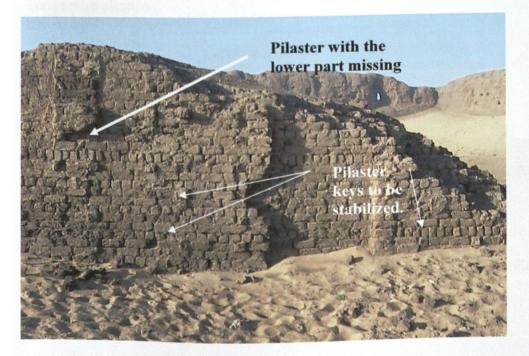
Remains of pilasters on the east side of the East Enclosure Wall. Pilaster keys project beyond the face of the mud brick wall in several areas here.
